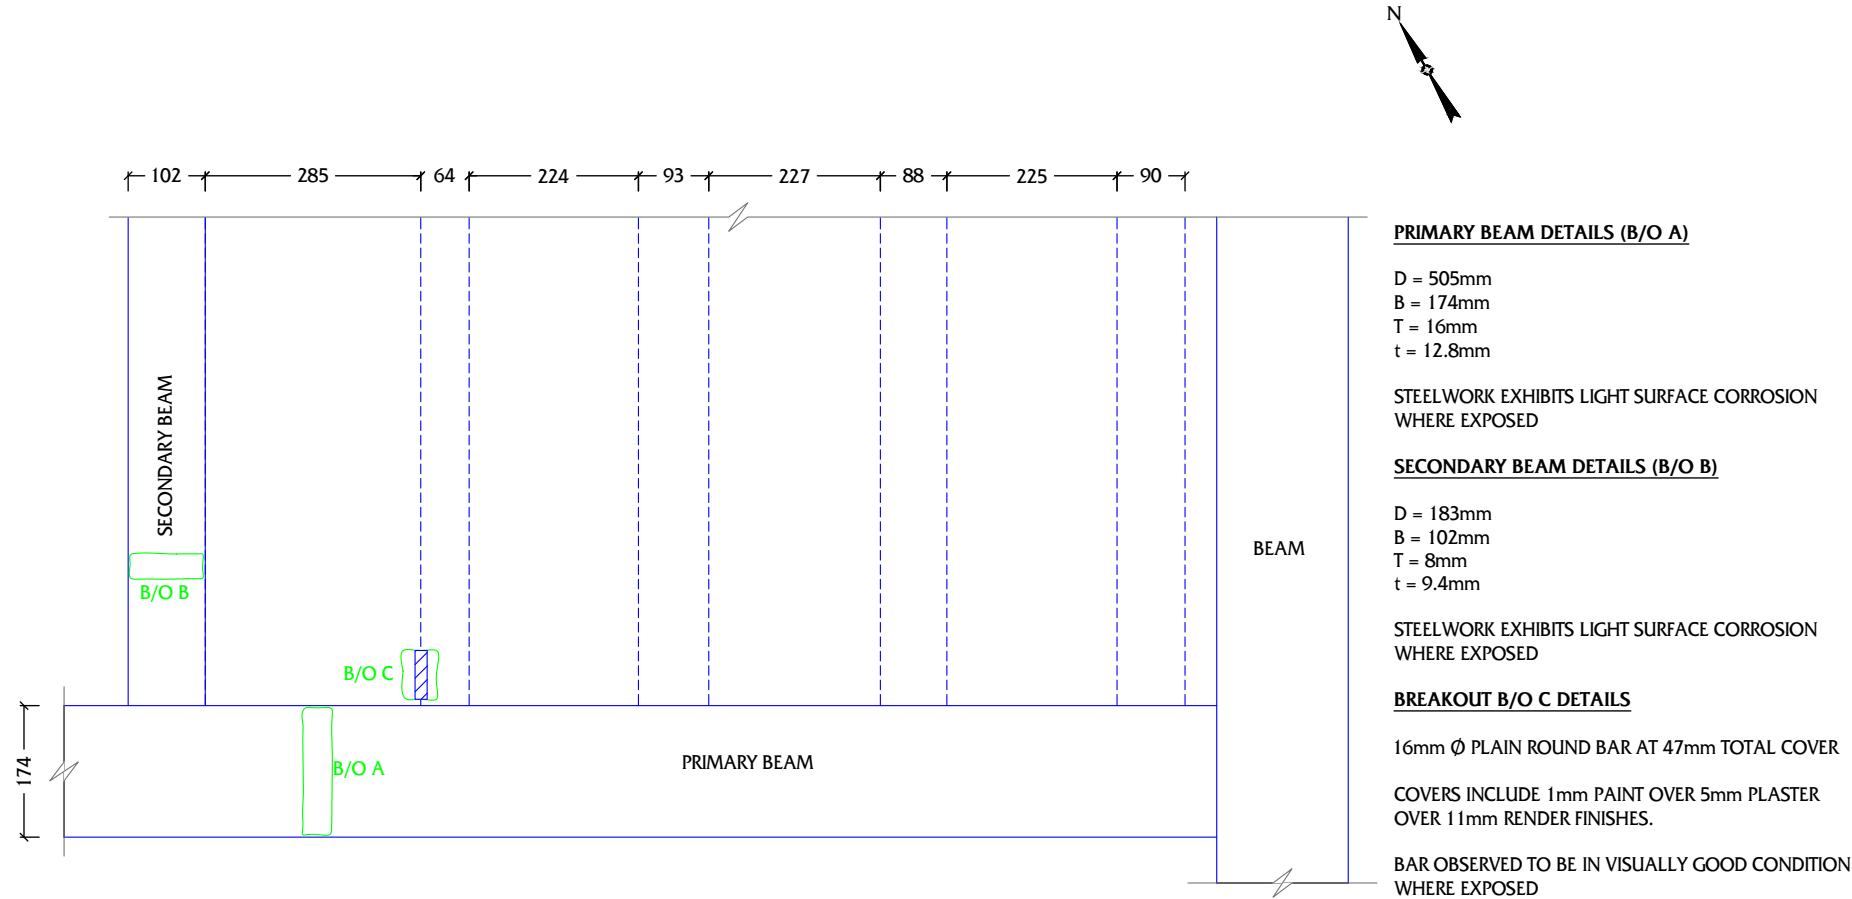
PART REFLECTED 1ST FLOOR SLAB SOFFIT PLAN SHOWING DETAILS OF BEAM AND PRECAST CONCRETE PLANKS - SURVEY AREA H/1-3 SCALE 1:10
